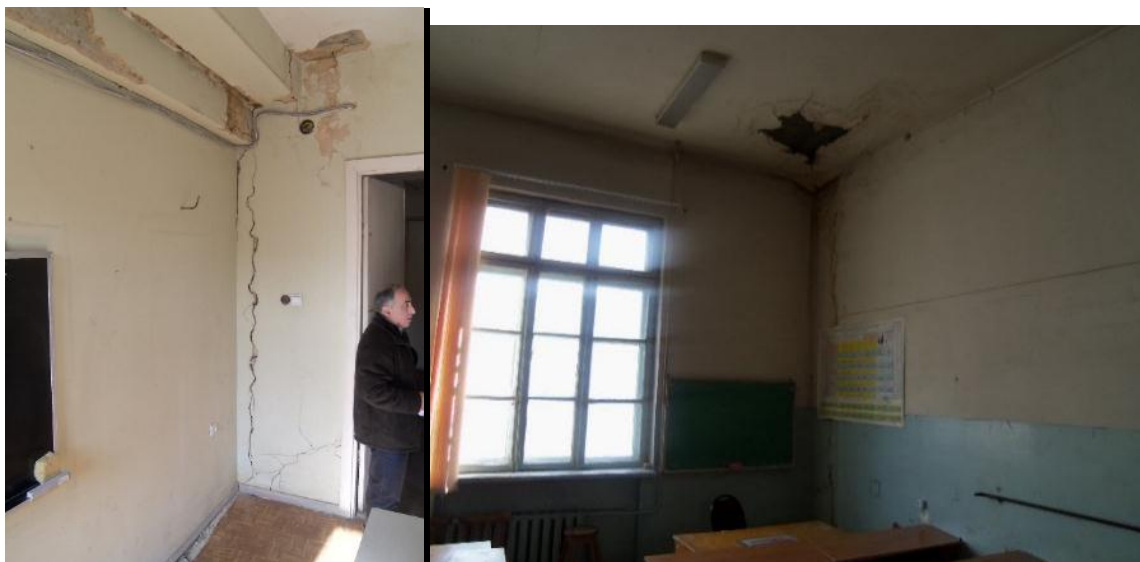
Possible structural issues in a proposed space at University Street Building.
